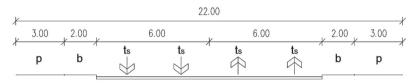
Geometrical cross-section of Boris Krajger – East [source: Author]
